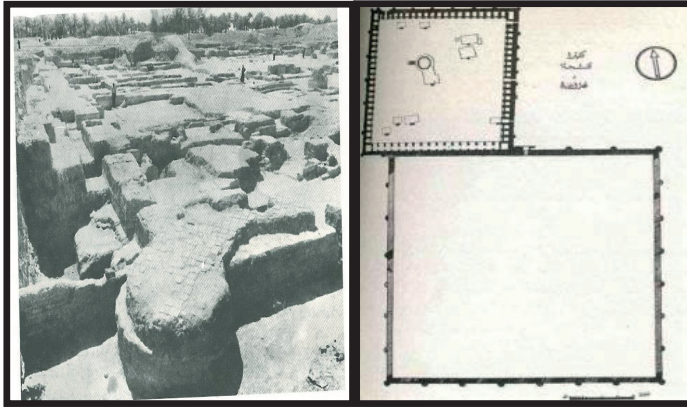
The Planned of the Mosque and the Emirate's House and Photo of Emirate's House Foundations [8]
